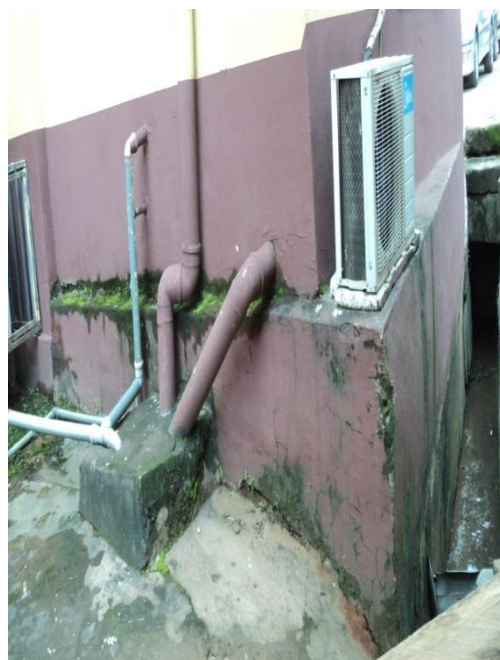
Stains and Cracks and Efflorescence at the back walls of the Laboratory block at NAUTH CHC Umunya
